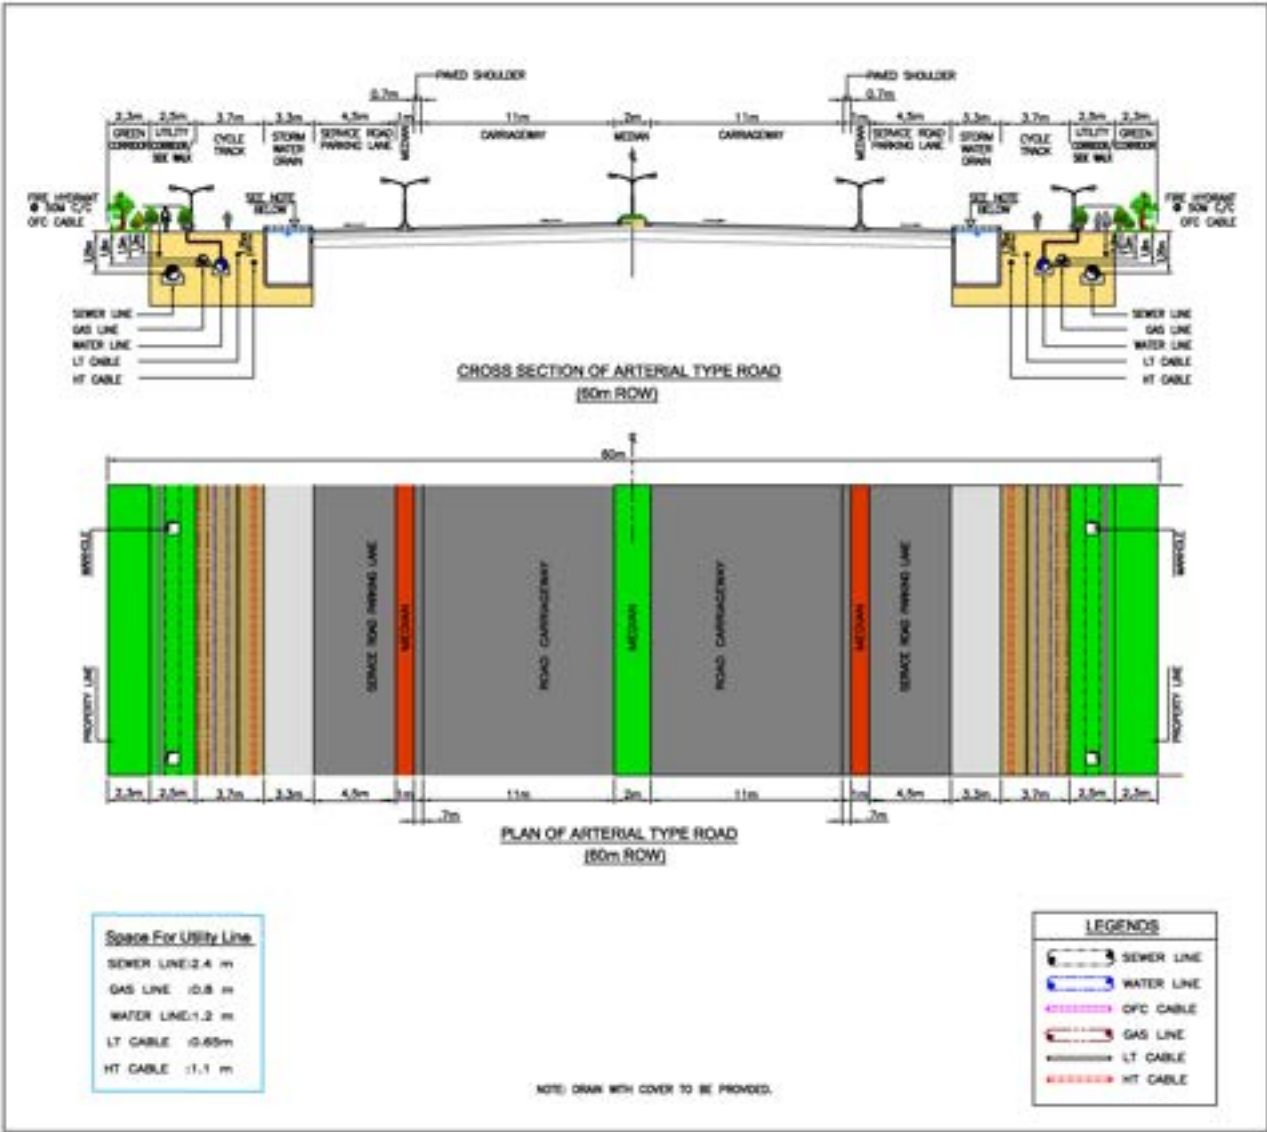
Cross Section and Plan of 60m ROW Arterial Type Road
